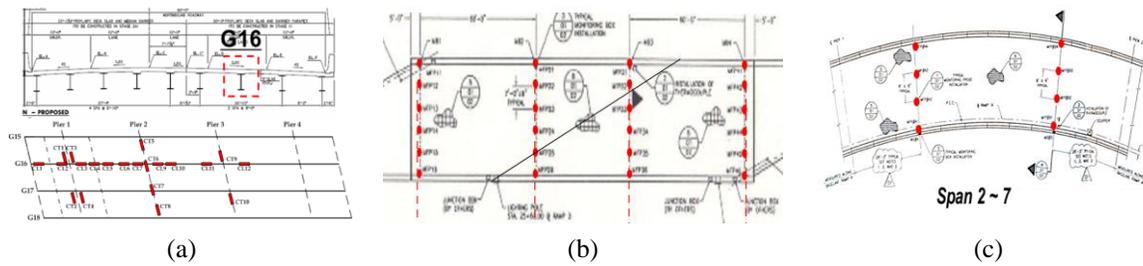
Sensor layout of Patcong Creek Bridge, Bridge No. 84.1 and Bridge No. 159.7A.
